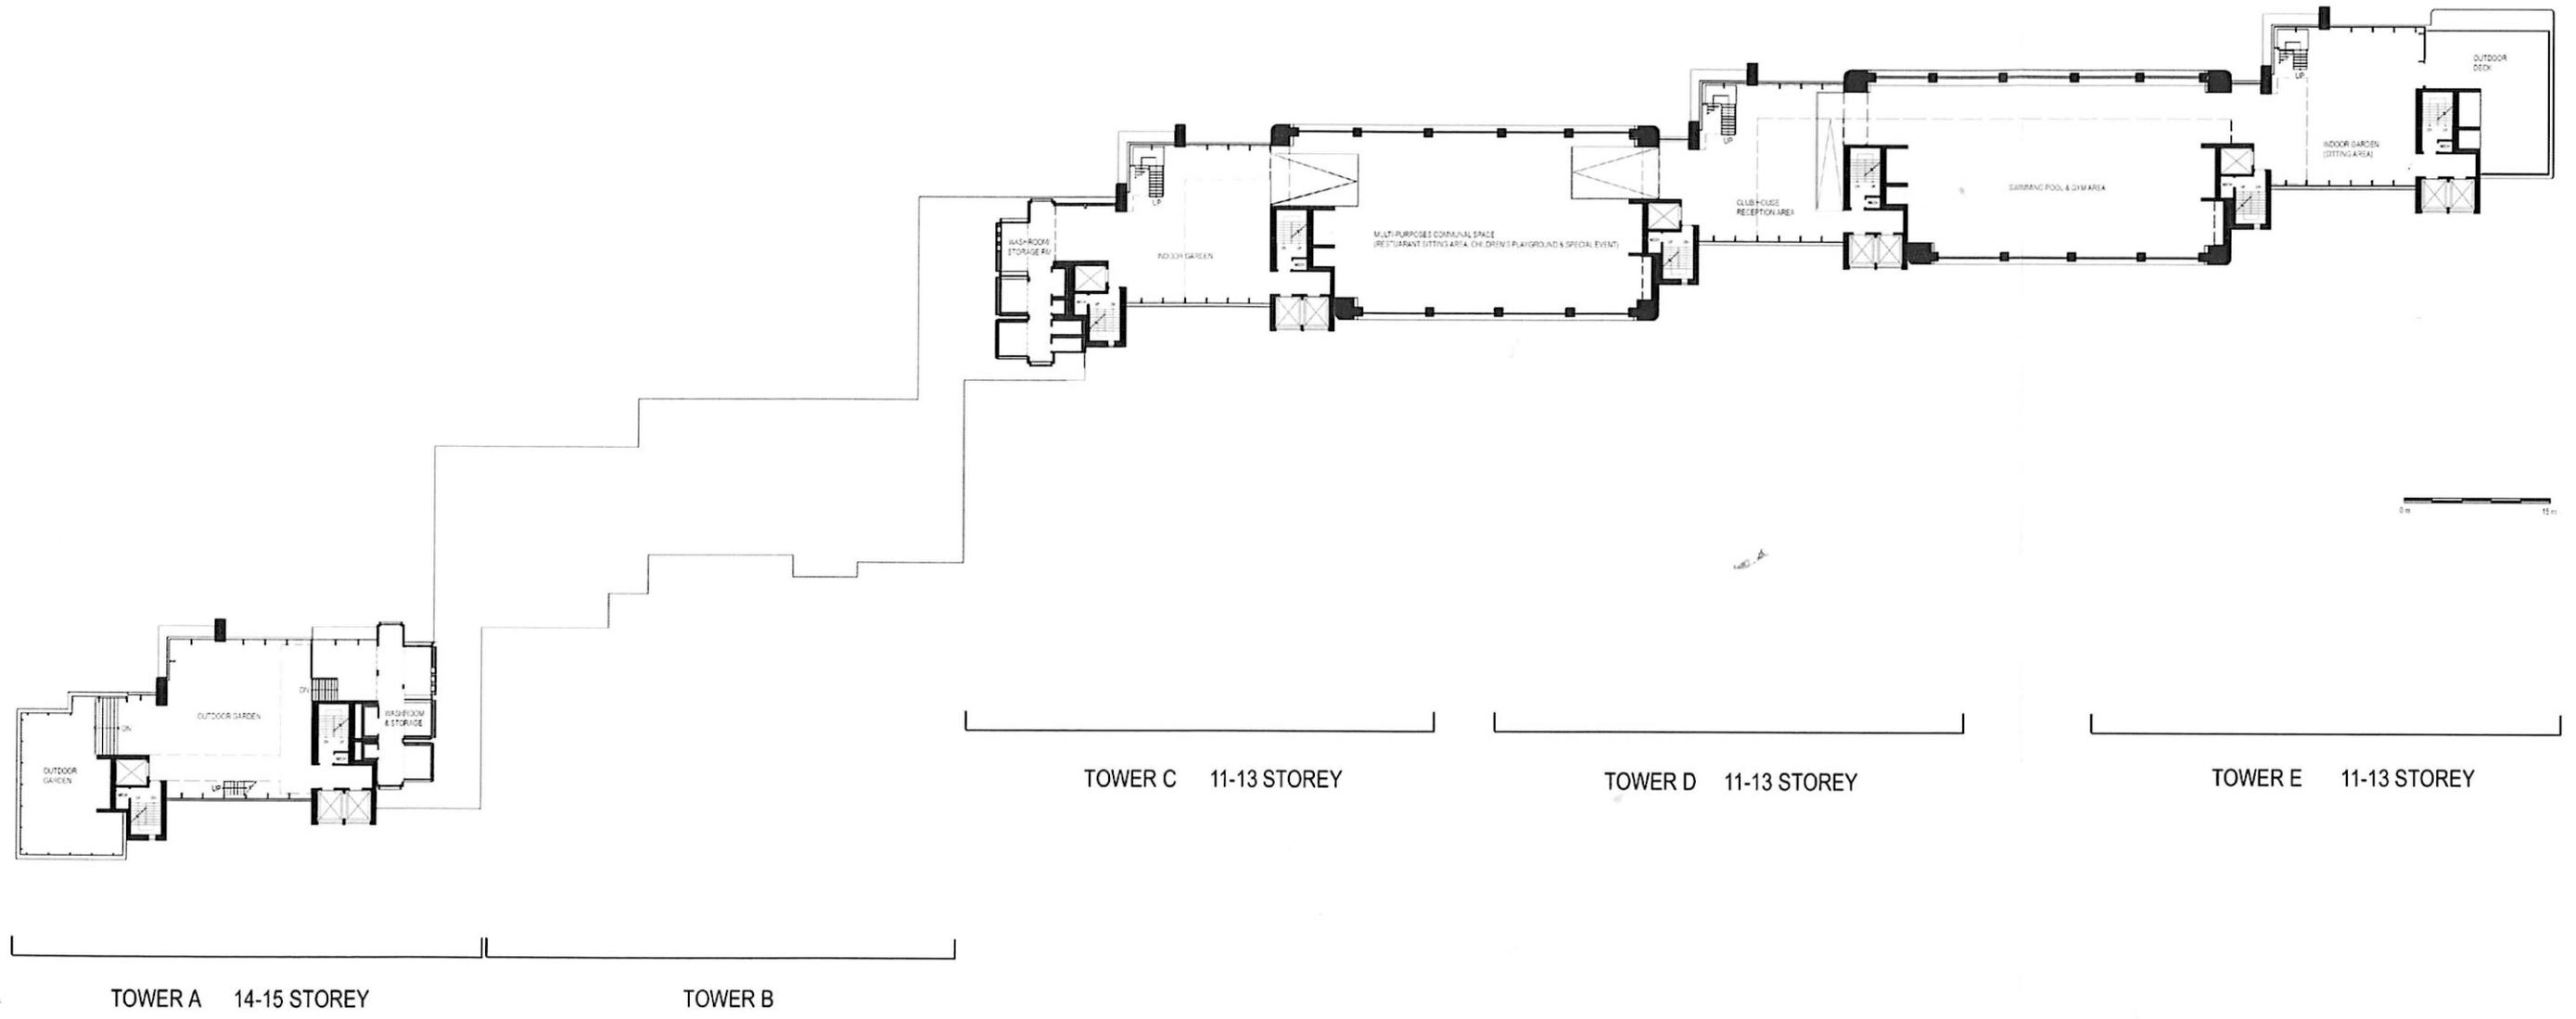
LOWER LEVEL OF THE 'GREEN POCKETS' COMMUNAL SPACES, FLOOR PLAN.
